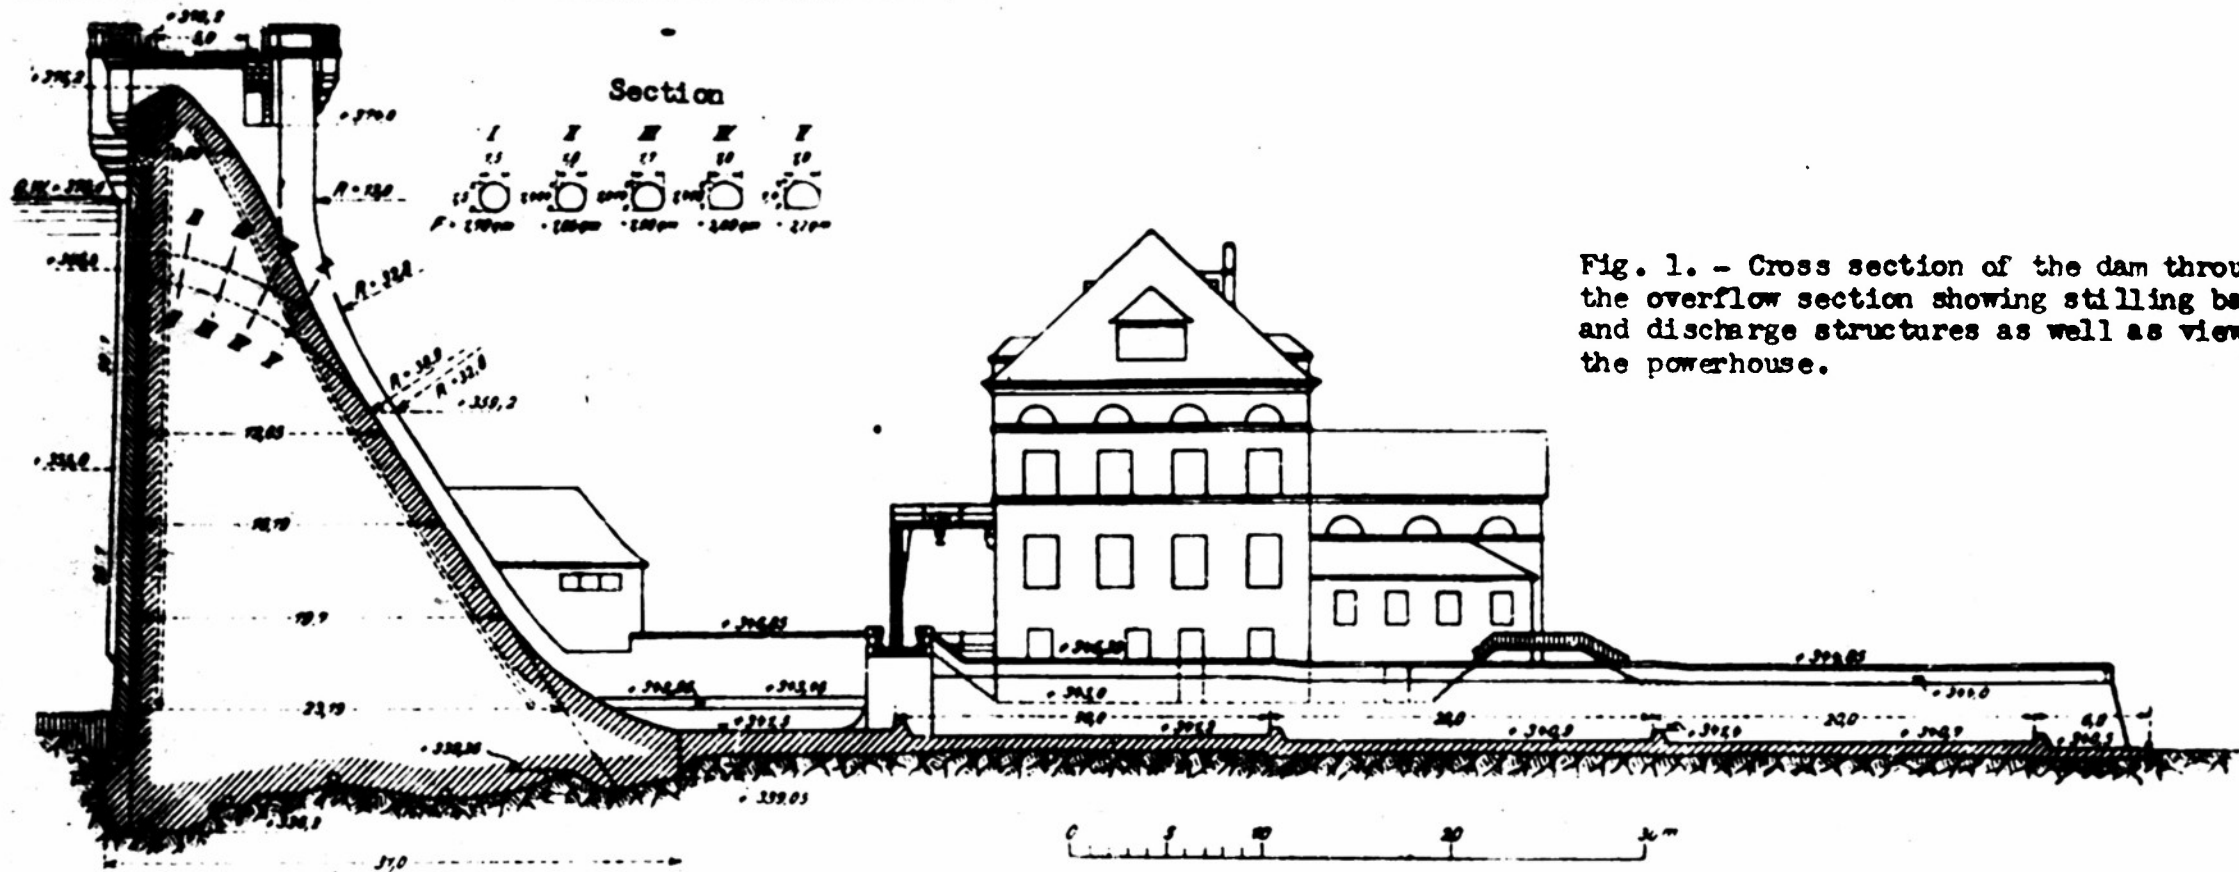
Cross section of the dam through the overflow section showing stilling basin and discharge structures as well as view of the powerhouse.
